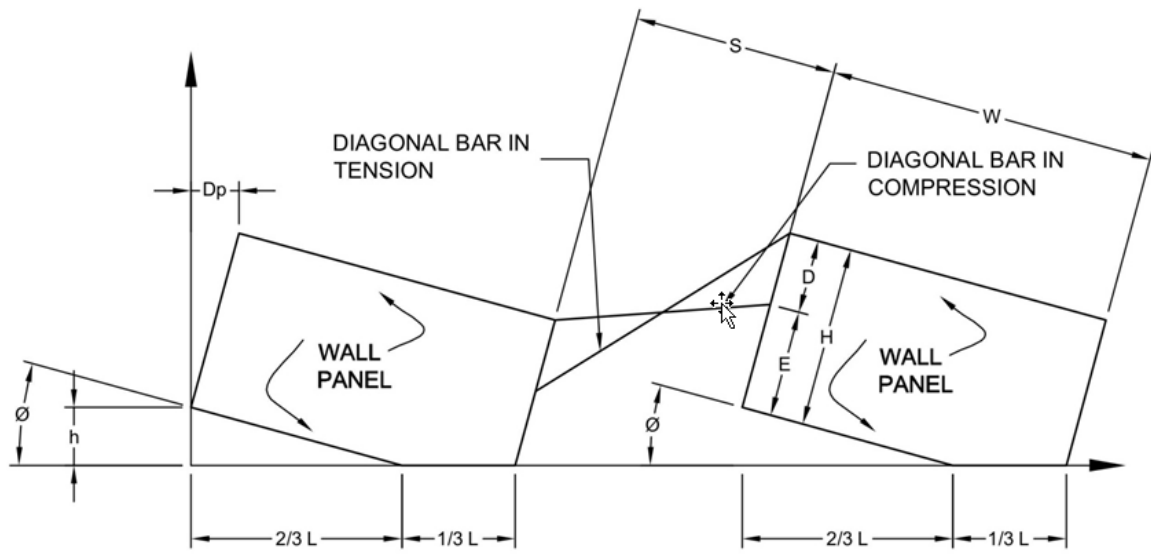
Deformed Configuration of a Single Storey Building with Deep Beams
